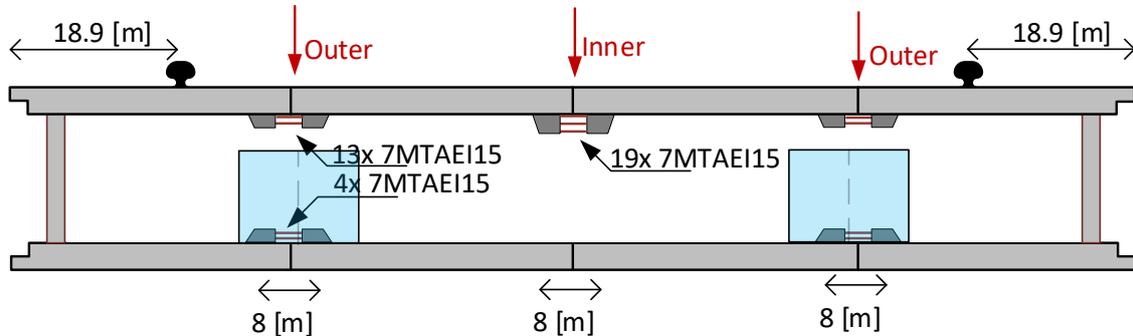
, POST-TENSIONED PRESTRESSING LAY-OUT; LONGITUDINAL VIEW
